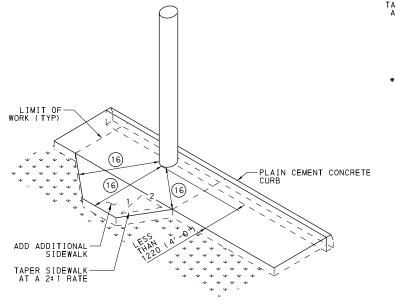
DETAIL ILLUSTRATES A TYPE 1 EXISTING RAMP REPLACED WITH A TYPE 2 RAMP. USE THIS DETAIL AS AN EXAMPLE TO REPLACE ANY RAMP WITH A DIFFERENT CURB RAMP TYPE.
